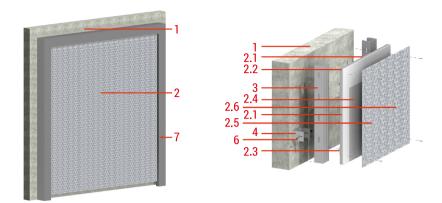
Axonometry and detail of the basic module. Legend: 1. Load bearing layer; 2. Modular panel; 2.1 Bi-directional aluminium frame, box profiles 60 x 30 mm, 4 mm thick; 2.2. Corner joint; 2.3. Plate with gravity anchorage hook; 2.4. PVC stiffening panel; 2.5. Four layers of felt for water drainage, root growth and plant containment; 2.6. Plants; 3. Aluminium mullion, C-section 125 x 100 mm, 8 mm thick; 4. Aluminium anchoring bracket; 5. Mechanical anchor for anchoring to the load bearing layer; 6. Screws for fixing upright to bracket system; 7. Aluminium profile for perimeter containment (Source: own elaboration)
